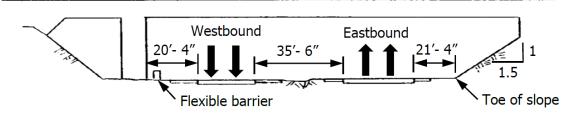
Bridge elevation view of horizontal clearances for separate westbound and eastbound highway features below the bridge, with a flexible barrier.
